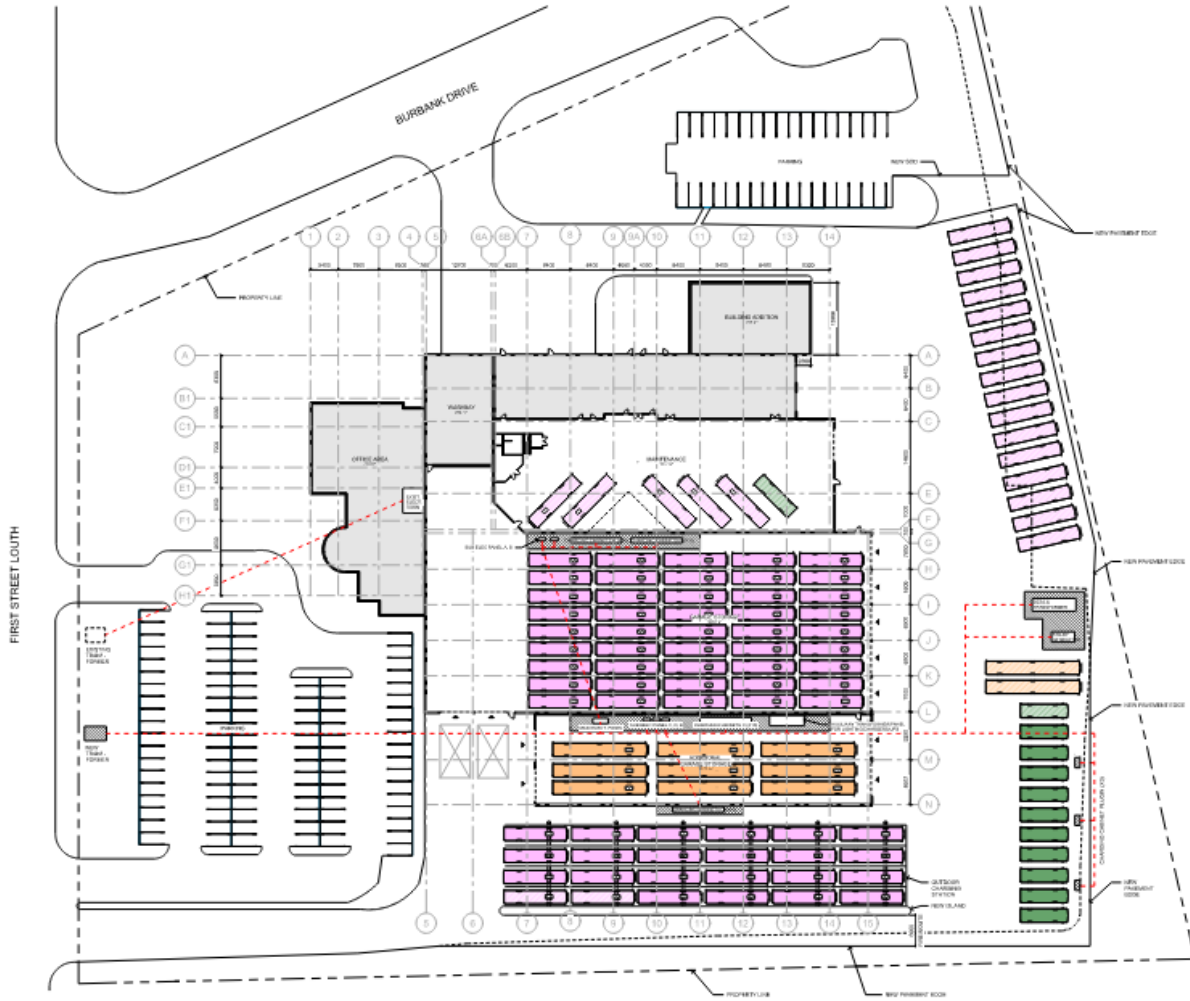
Proposed St. Catharines BEB Facility Site Plan (Conceptual Only)
